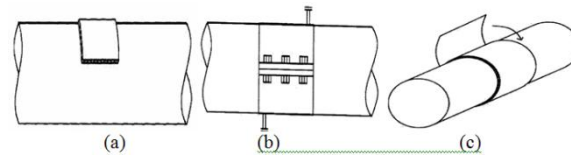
Types of pipeline repair systems (a) Welding (b) Mechanical clamp (c) Wrapping (Alim, 2011).
